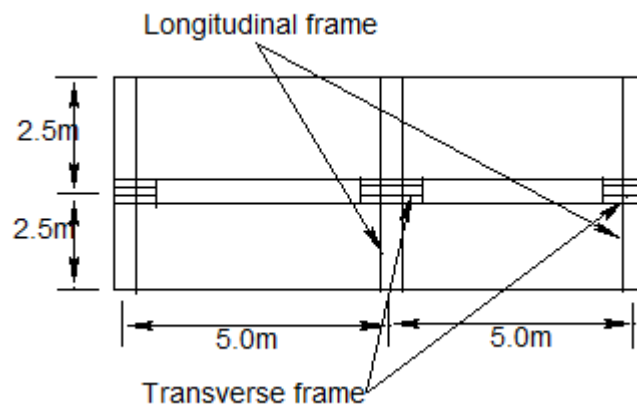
b: Plan showing the column and beams at floor levels of the plane frame
